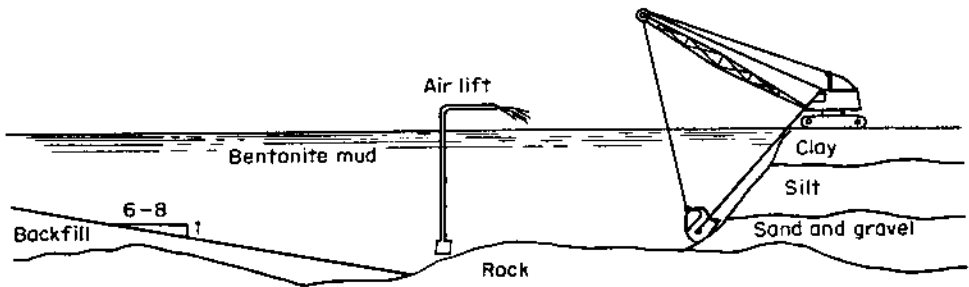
Slurry trench excavation by dragline (Xanthakos 1979).
